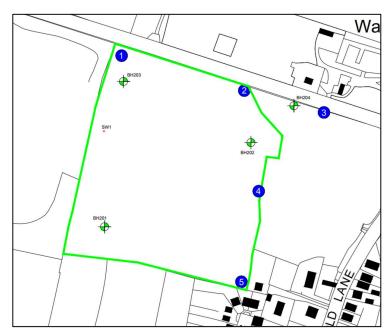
B: Site Plan (taken from AAe drawing 163407/D/006)
